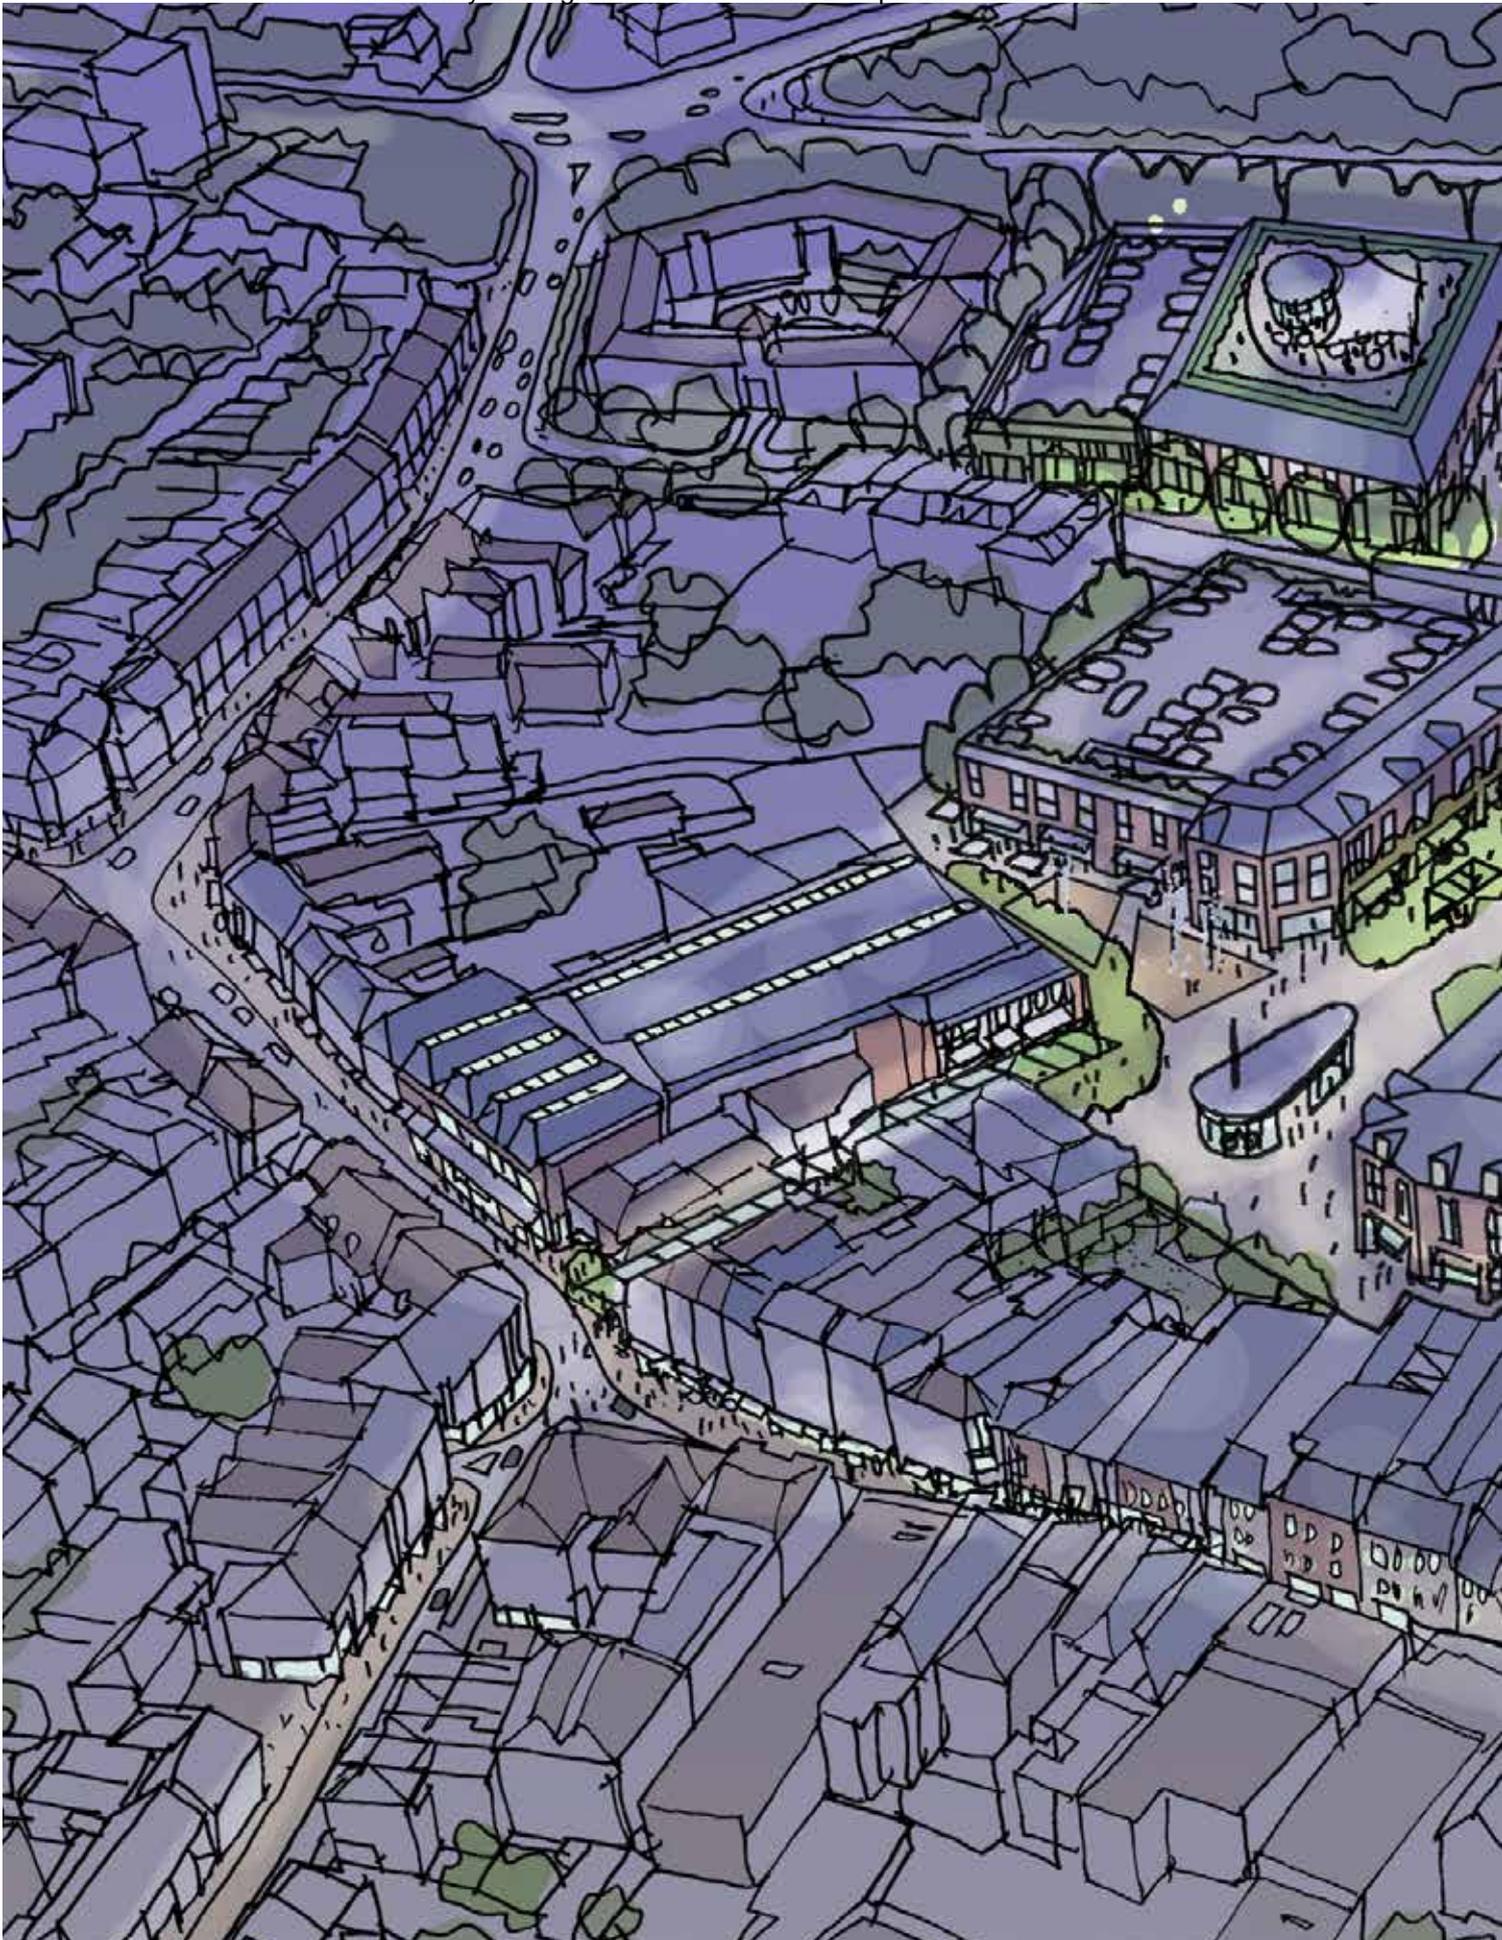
Artist Impression Aerial View of Long Term Masterplan at night
